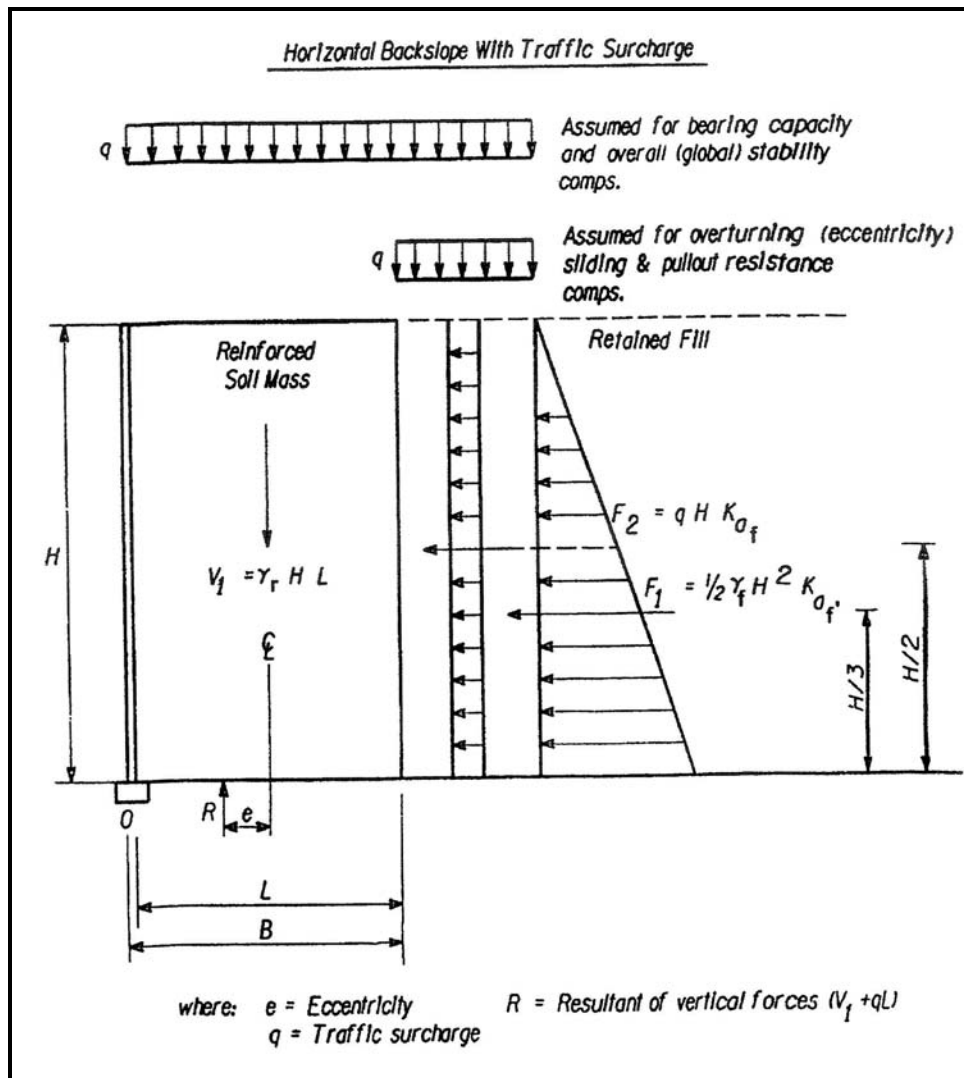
, MSE Wall Earth Pressure for Horizontal Backslope With Traffic Surcharge (Mechanically Stabilized Earth walls and Reinforced Soil Slopes Design & Construction Guidelines – March 2001)
